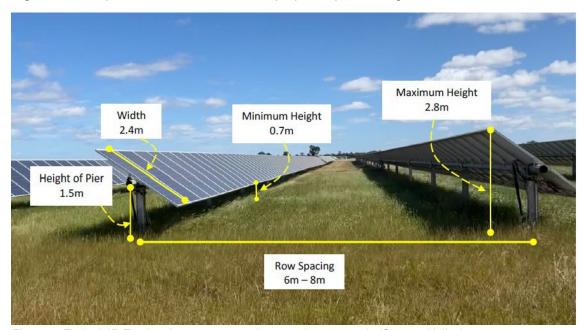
Typical 1P Tracker Arrangement – photograph not to scale (Source: Helios)
